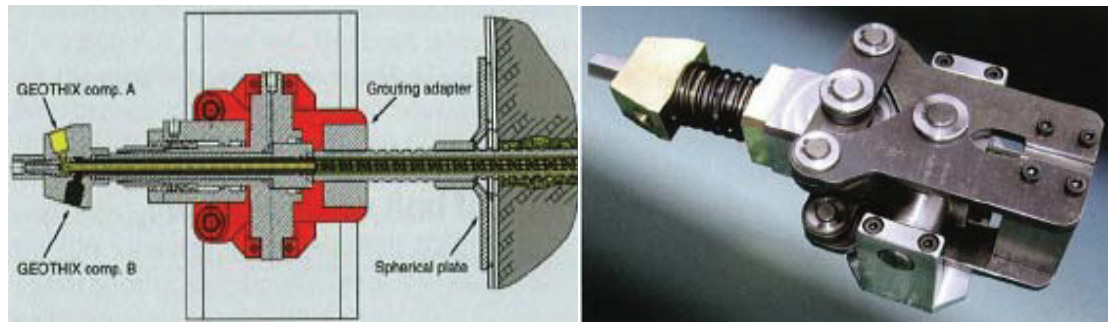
The sectional view and picture of hydraulic injection adapter [42]
